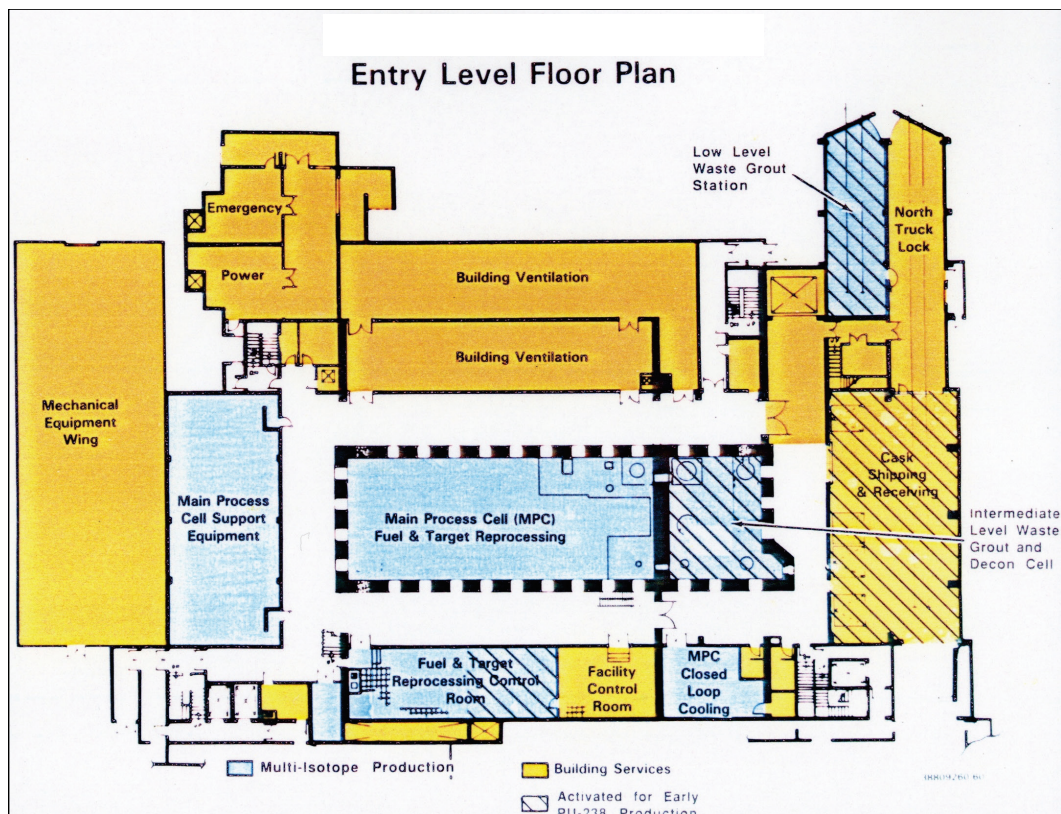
FMEF Process Building, 0 Foot Level Floor Plan. Note: Floor plan as laid out for the Radioisotope Thermal Generator Mission
